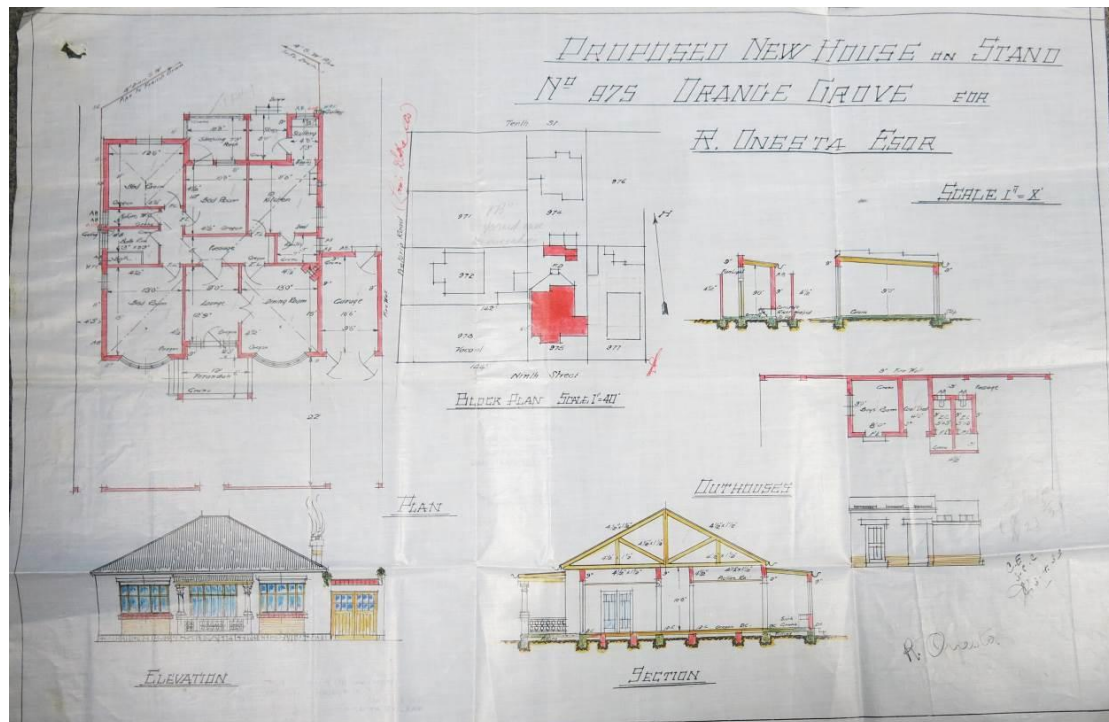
Plan for proposed new house on Stand 975, Orange Grove
